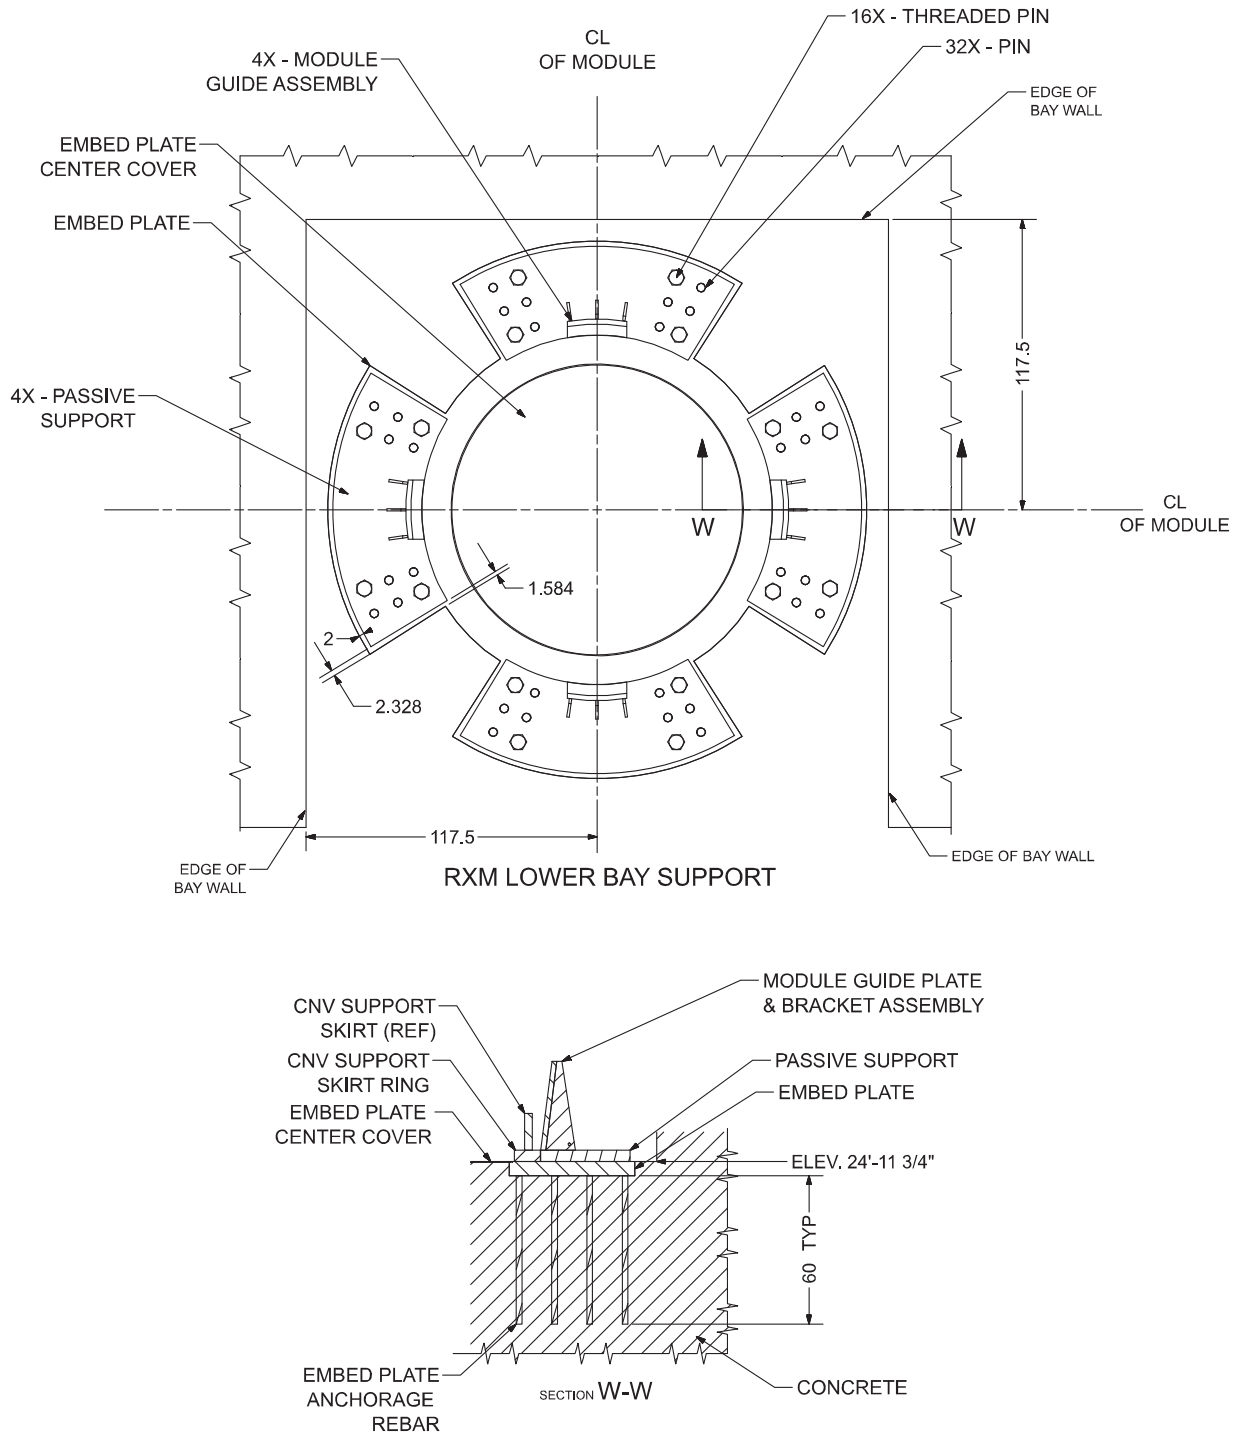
B-49: Plan View and Cross Sections of NPM Embed Plate
